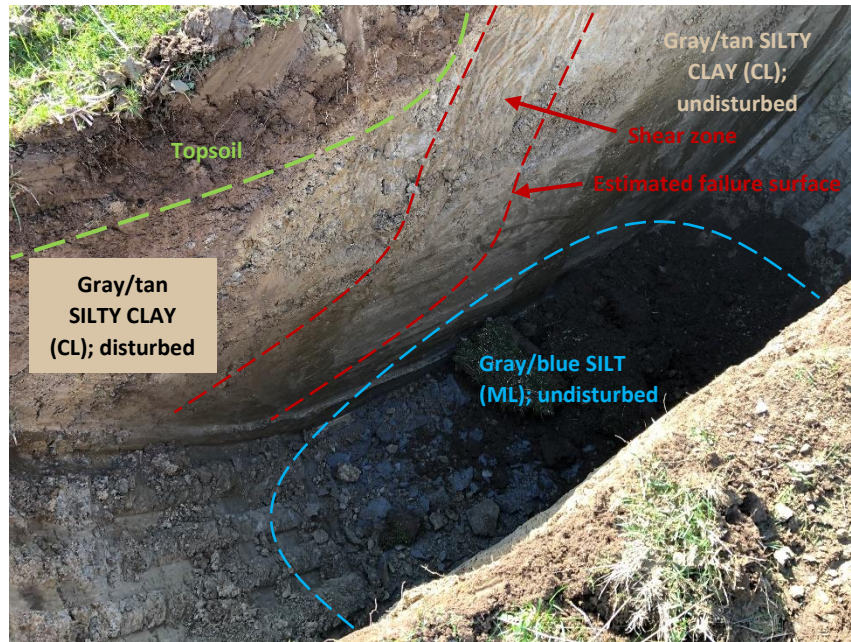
Subsurface conditions encountered in TP-3 (1 of 2).
